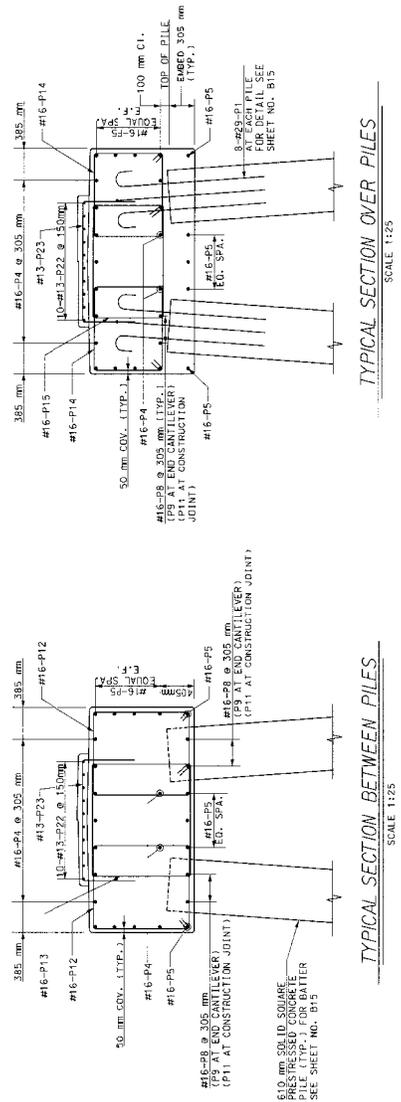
Pile Bent Section Between Piles and Over Piles Stage I
